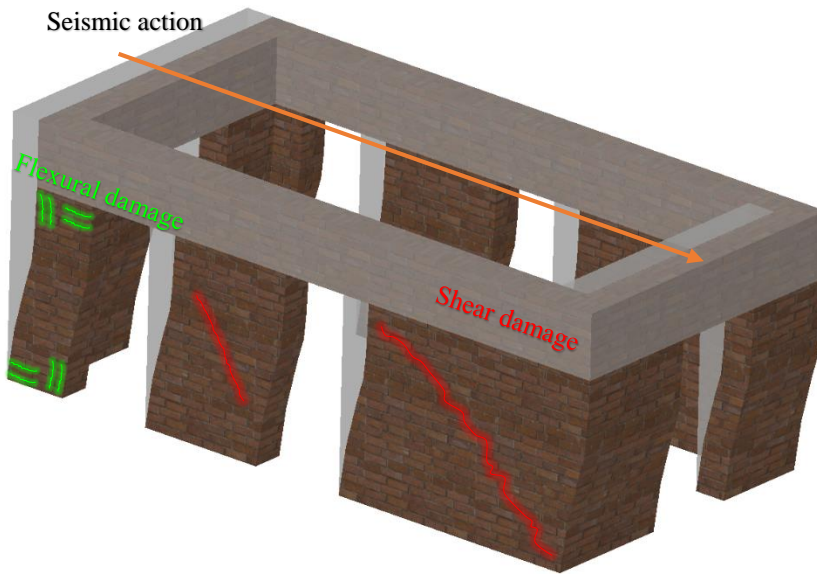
Typical damage occurred due to in-plane behaviour of masonry walls.
